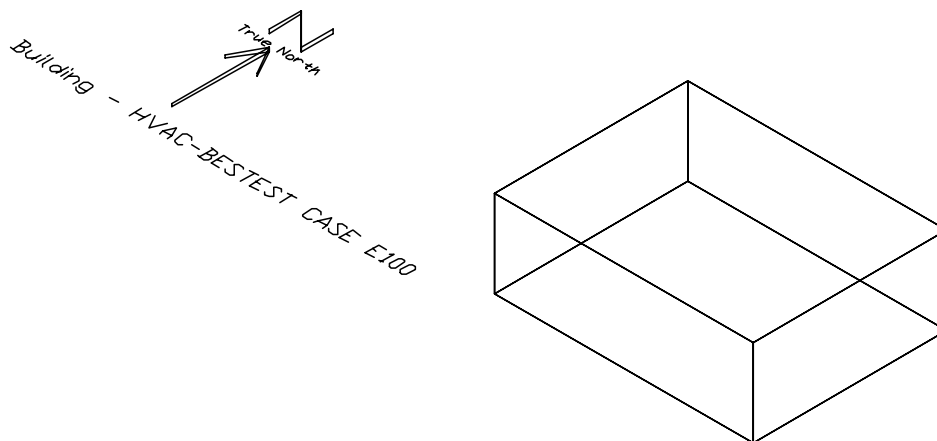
Base Building (Case E100) - Isometric View of Southeast Corner
